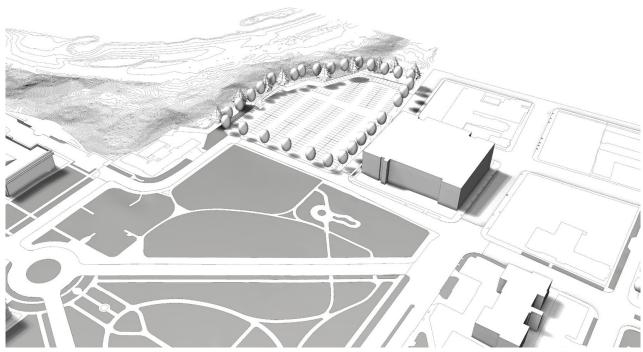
ALTERNATIVE 1.B - REPLACE GA BUILDING WITH SURFACE PARKING
